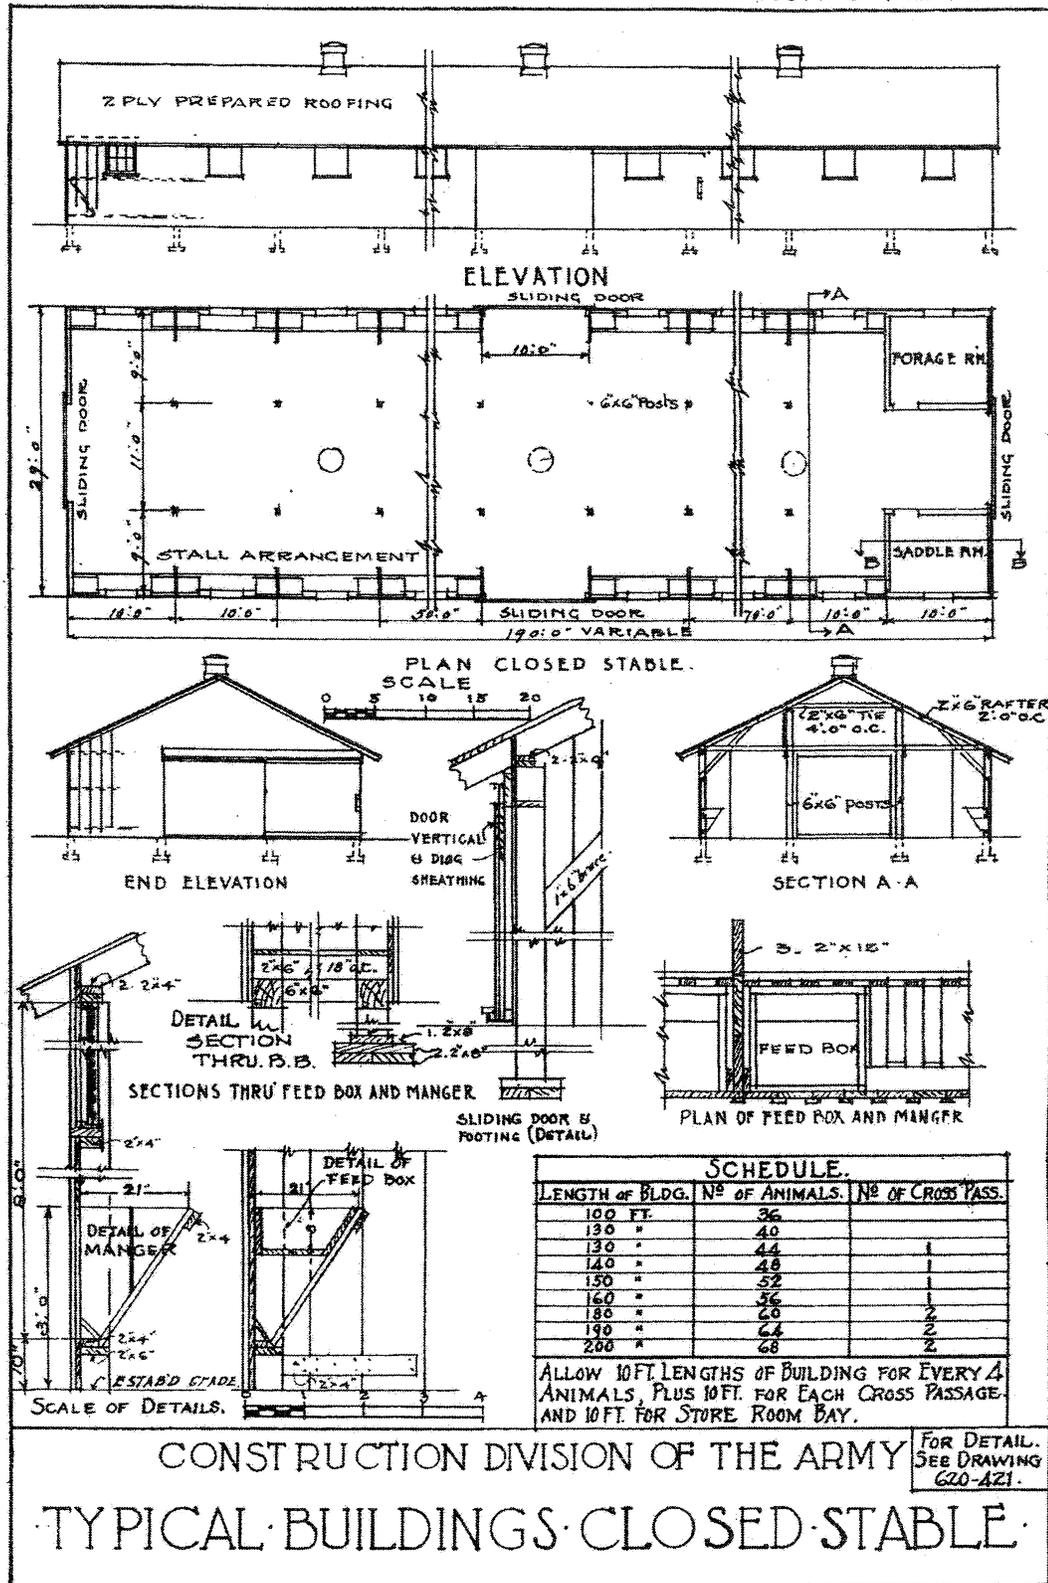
"TYPICAL BUILDINGS, CLOSED STABLE." A 1919 STANDARDIZED Q.M.C. PLAN VERY SIMILAR TO FORT HUACHUCA'S CAVALRY STABLES (CONSTRUCTION DIVISION OF THE ARMY 1919:SECTION C PLATE 58).
